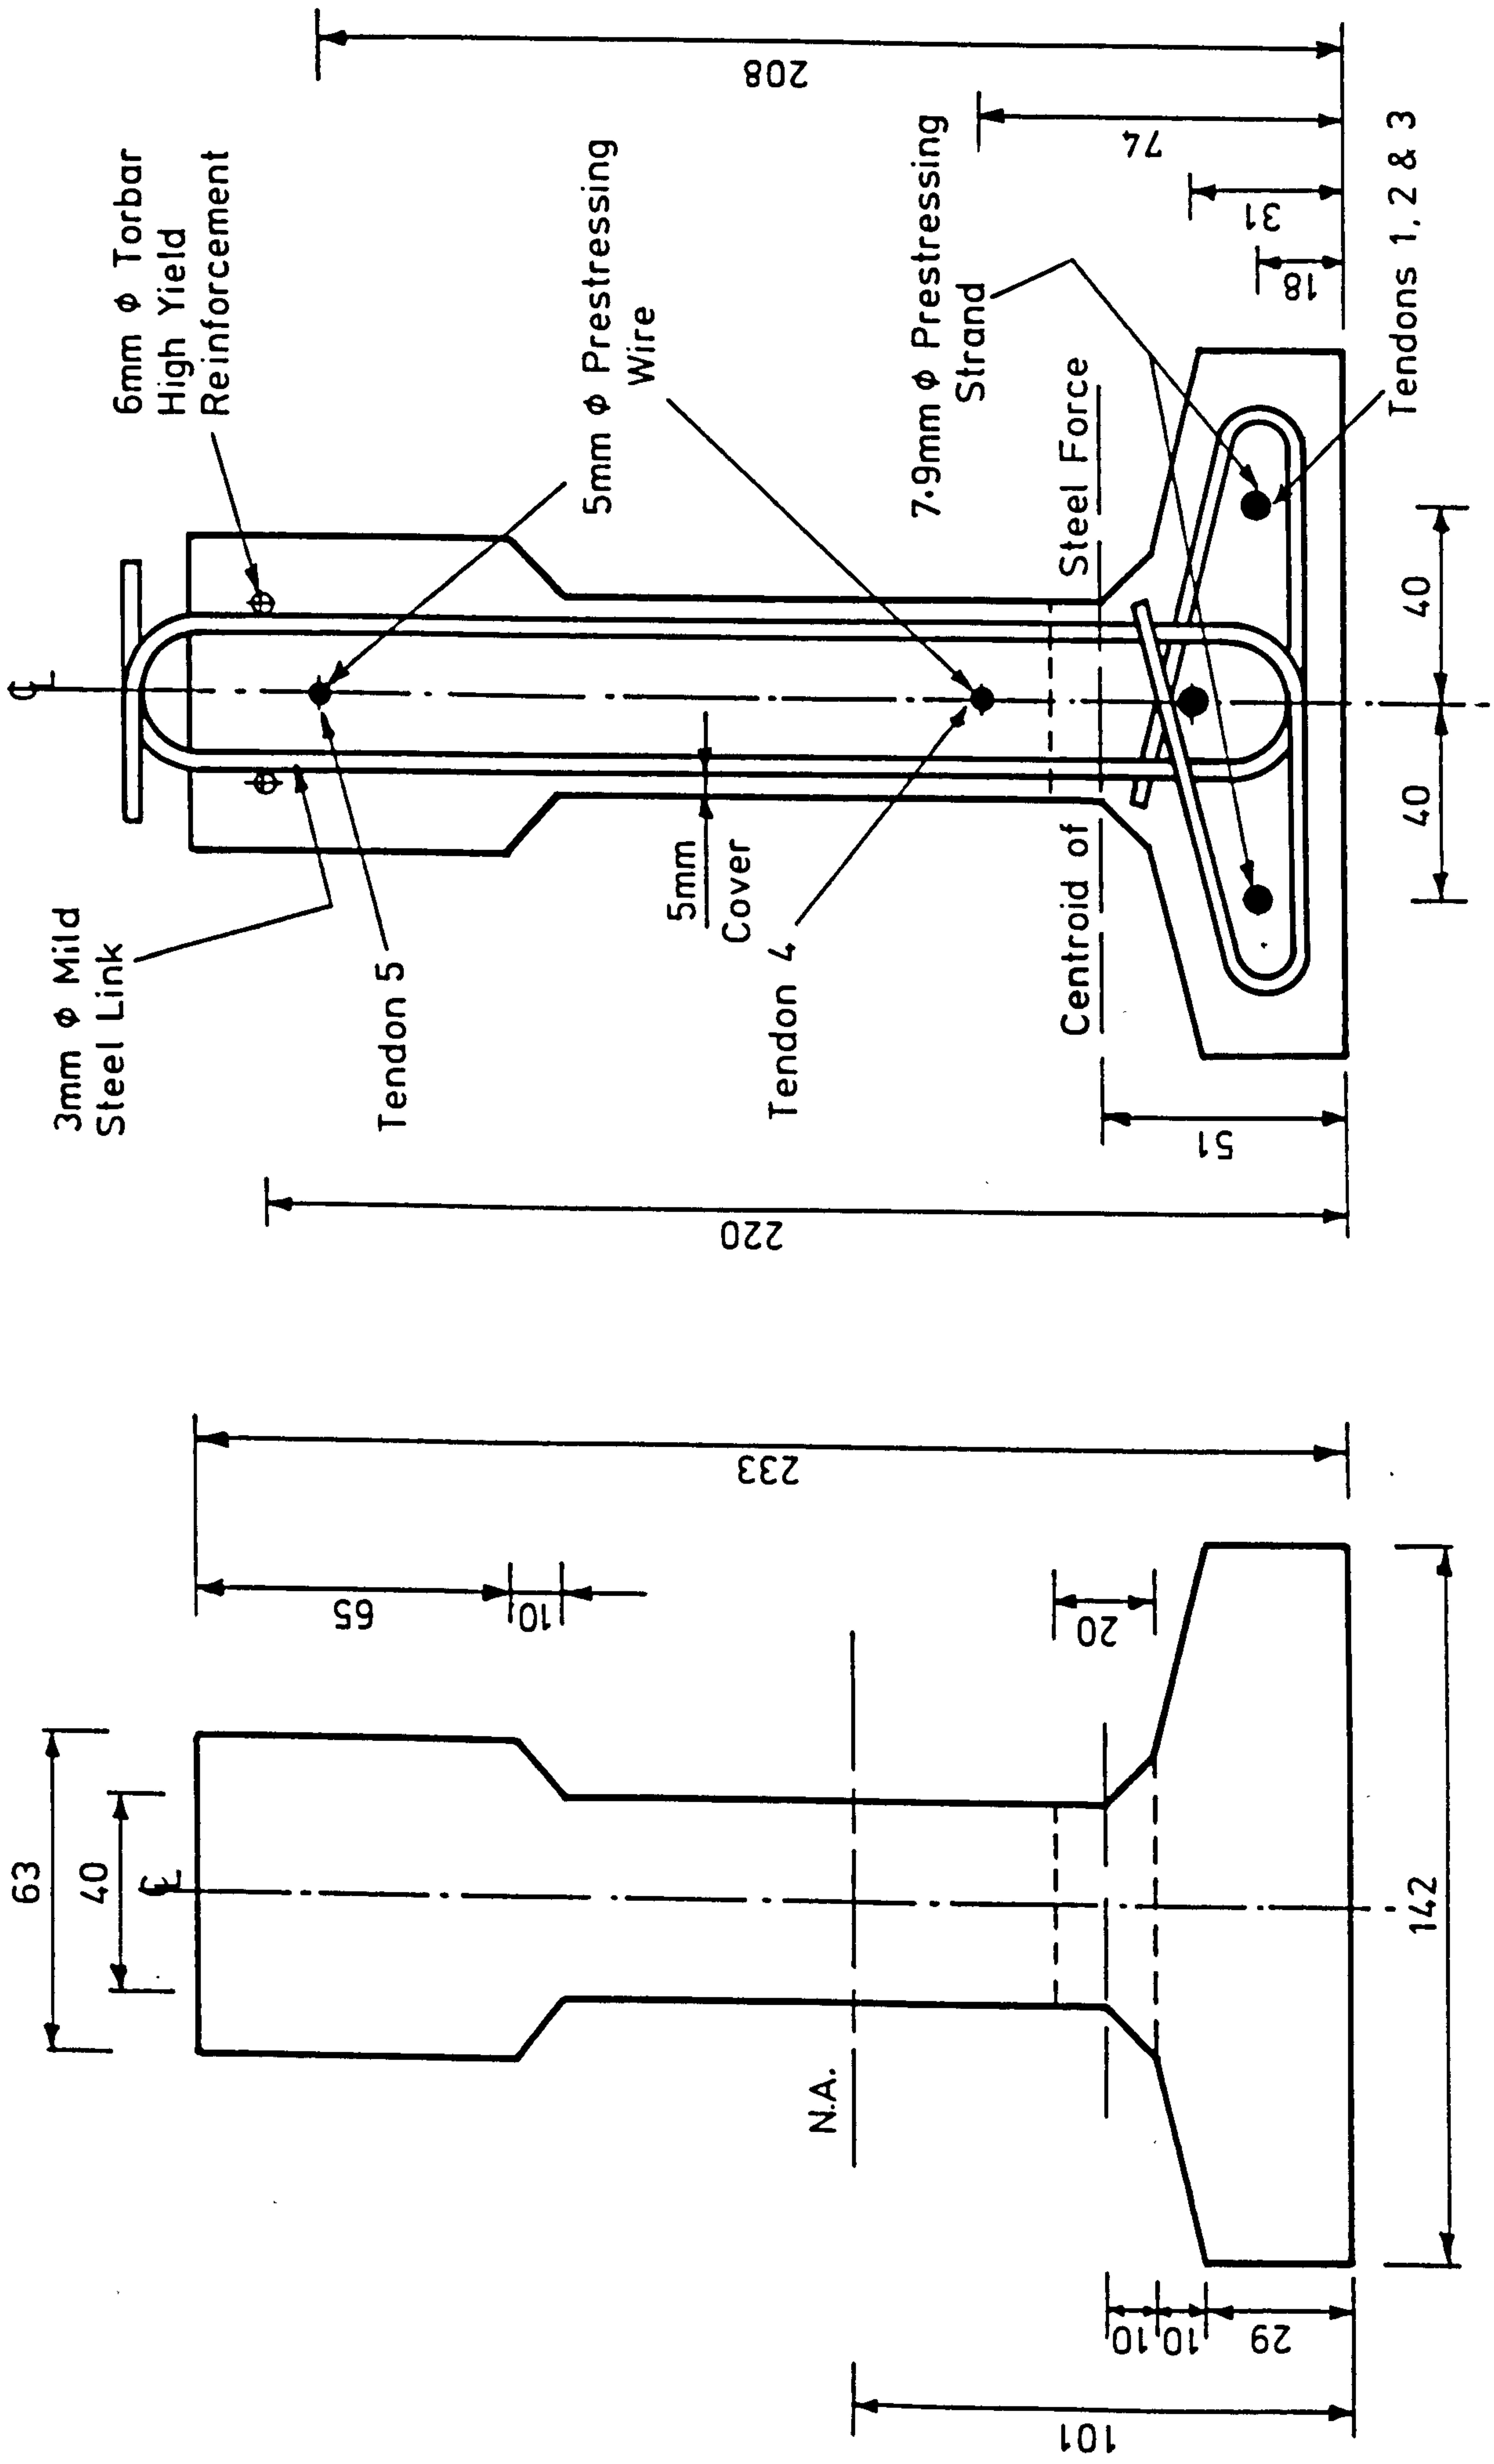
DETAILS OF MODEL 2 BEAM PROFILE AND PRESTRESSING LAYOUT.
